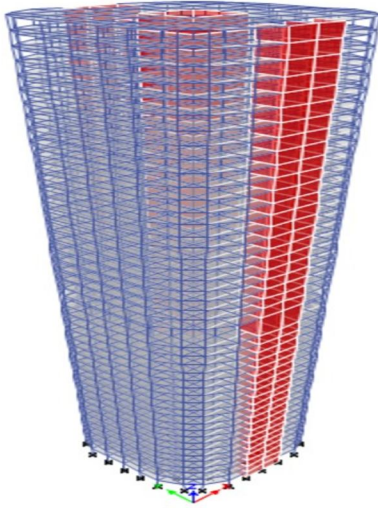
Soft Storey at 22nd floor (storey 22) without LRB
